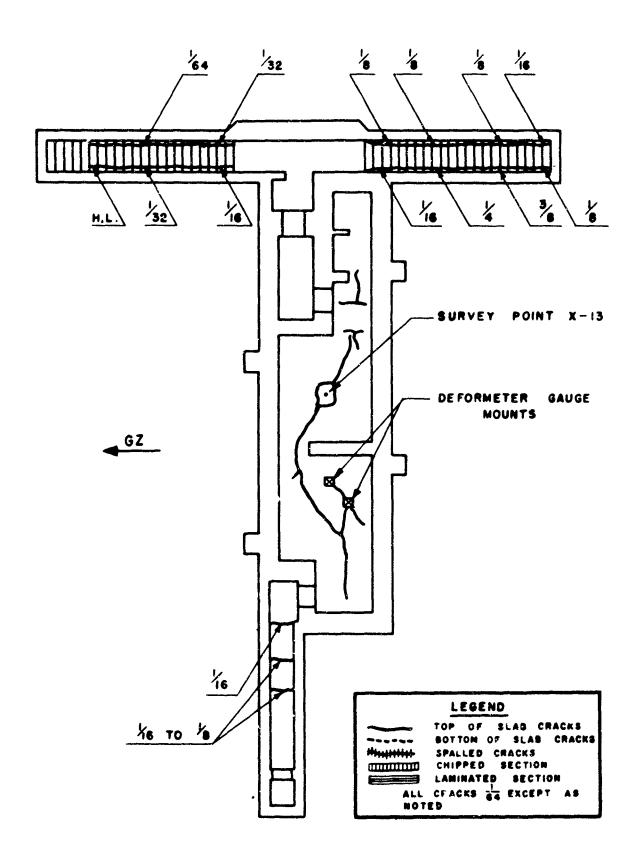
Floor-slab crack pattern, structure II-1.
